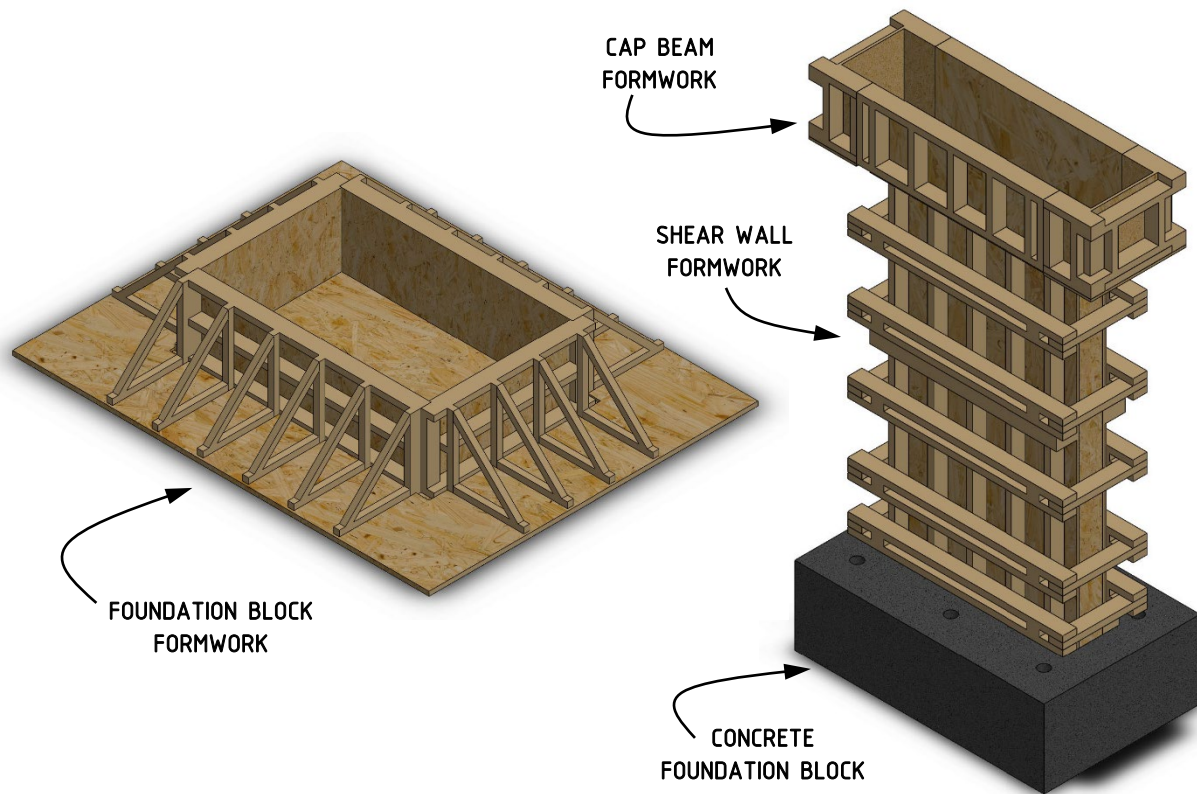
Assembled 3D model of reusable modular formwork: foundation block (left); shear wall and cap beam (right).
